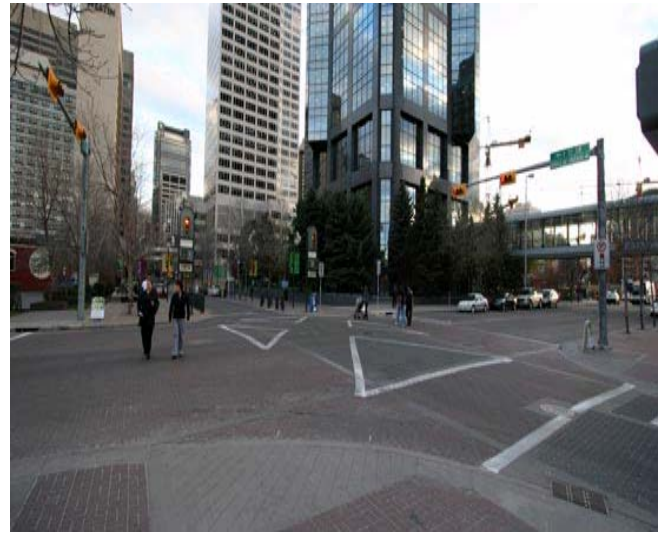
Road Markings used in Calgary at the 3 Street/2 Avenue SW intersection
